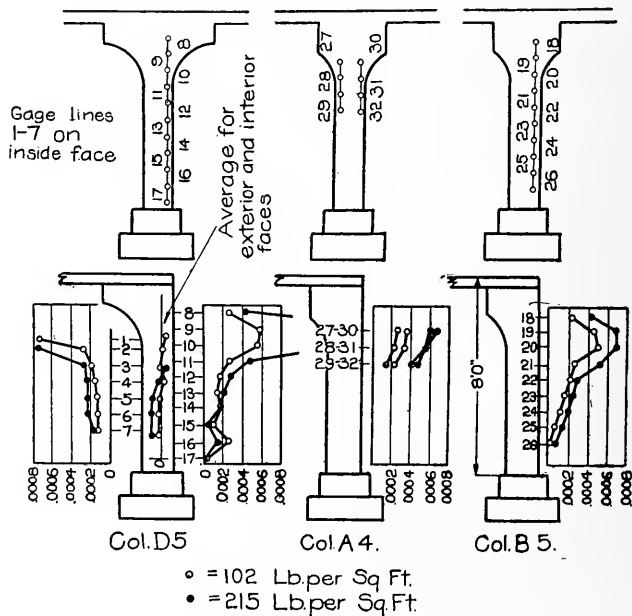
DIAGRAM SHOWING DEFORMATIONS IN COLUMNS A4, B5, AND D5 OF WORCESTER TEST STRUCTURE.
